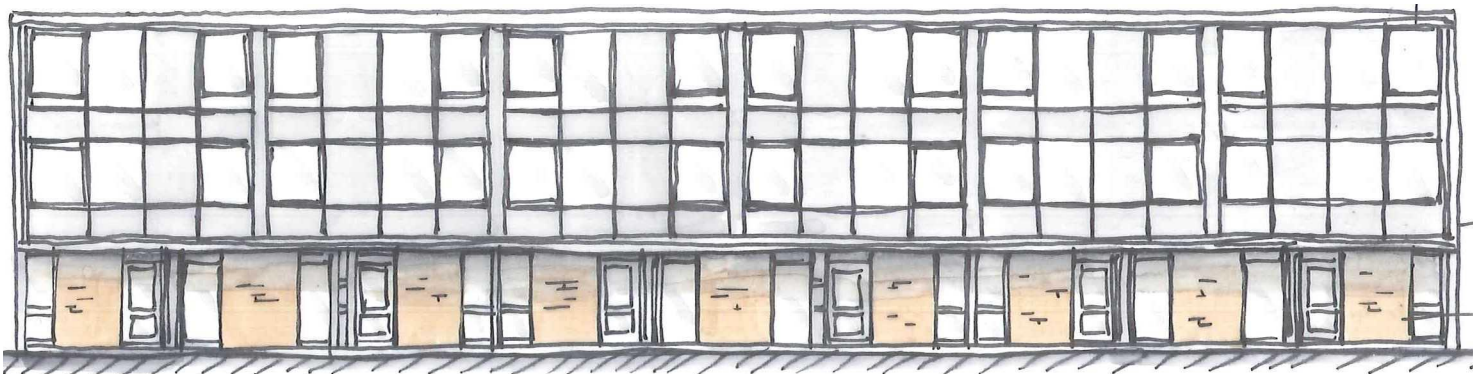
Original north facade of the terraced houses in Vrieheide. The ground floor is made as brick masonry cavity wall and the facade of the first and second floor is a aluminium framed curtain wall with panels and glass. (own ill.)
